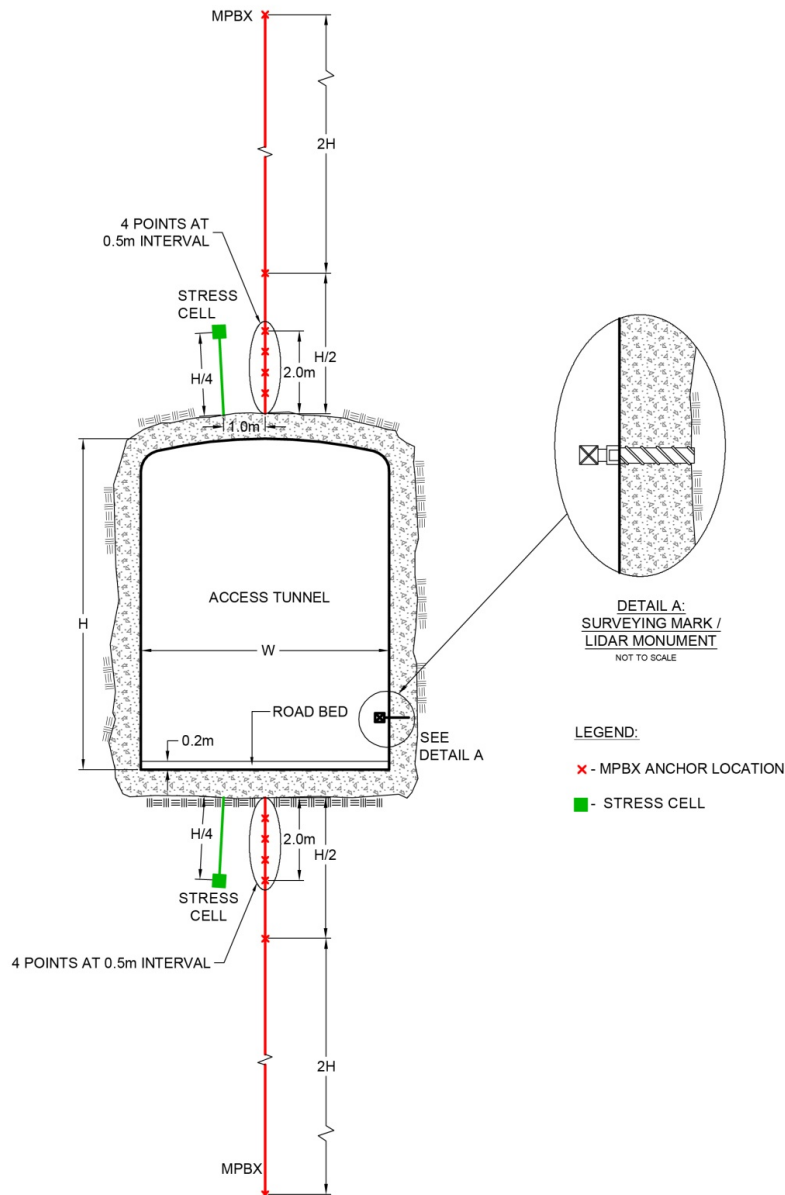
Typical Instrumentation Array in Access Tunnels
